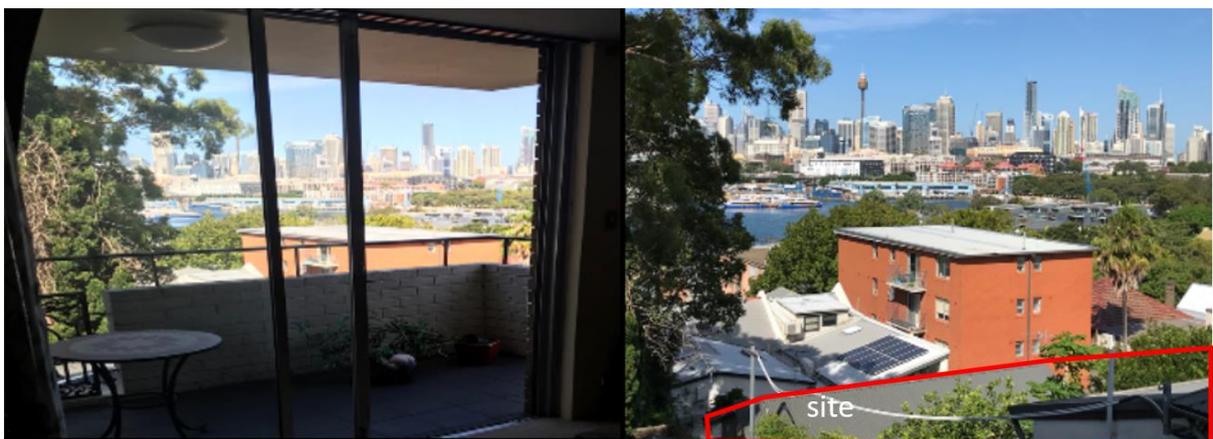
View from living room and balcony (standing) of second floor corner apartment (resident supplied). Roof of studio addition within subject site can be viewed in second image, outlined in red.
